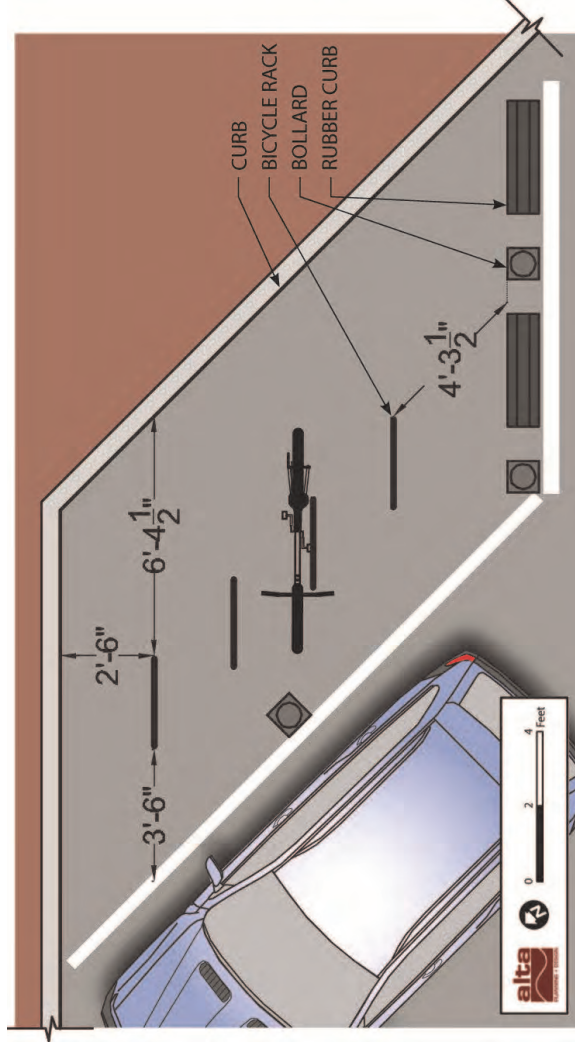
5th Avenue and B Street Bicycle Parking Plan View
